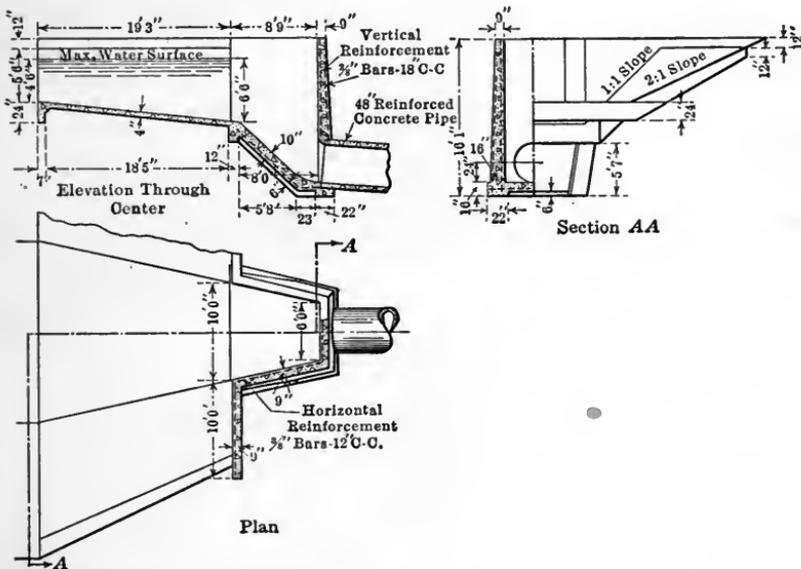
Inlet to reinforced concrete wasteway chute. Boise Project, Idaho.
